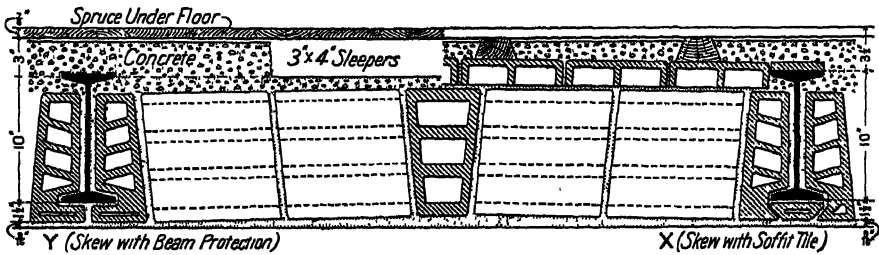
FLAT FLOOR ARCH (COMBINATION-METHOD CONSTRUCTION).
